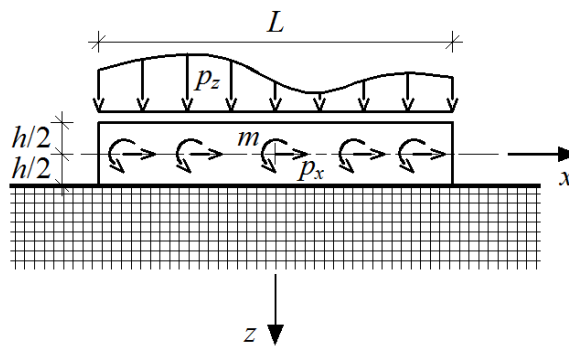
Beam under general loads bonded to an orthotropic half-plane.
